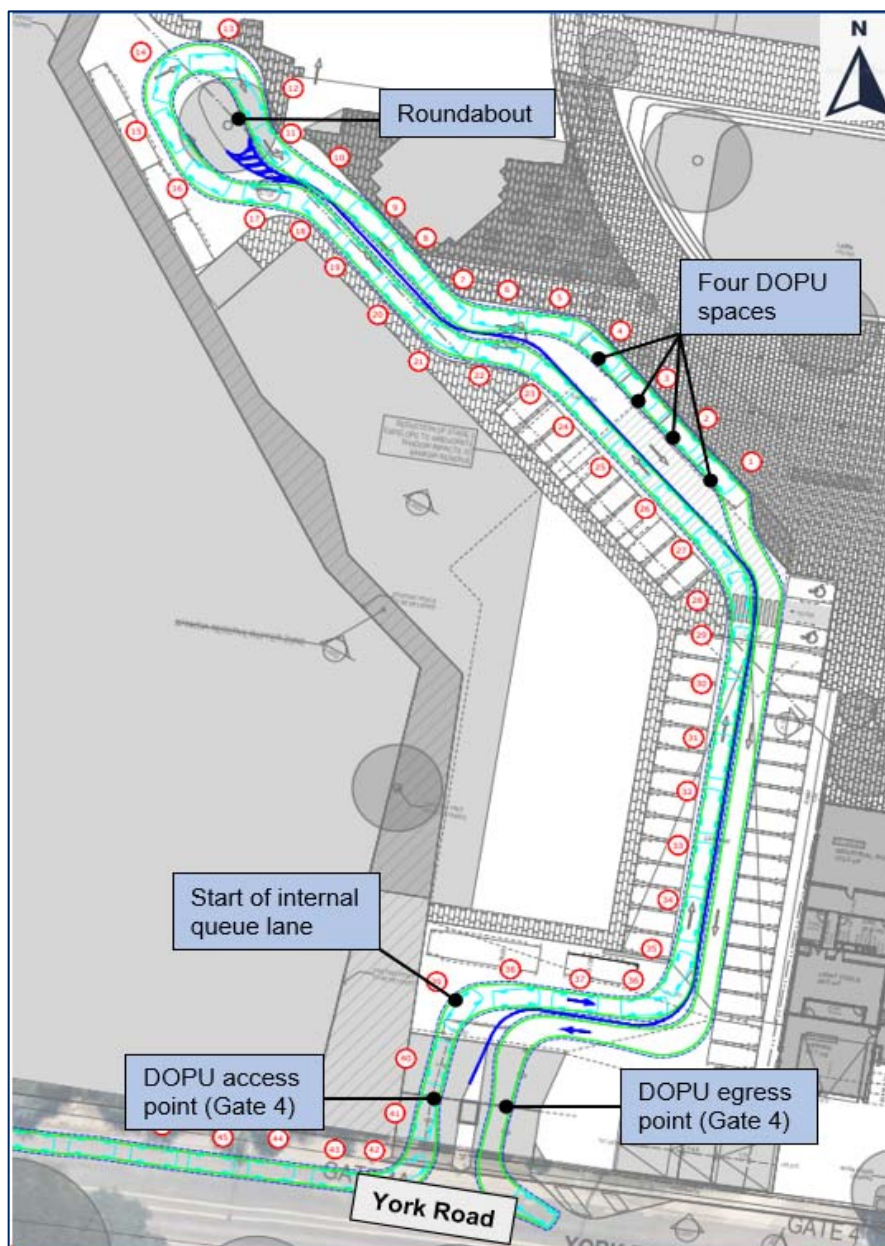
| Proposed on-site DOPU arrangement – senior school (Source: Applicant's RtS)
